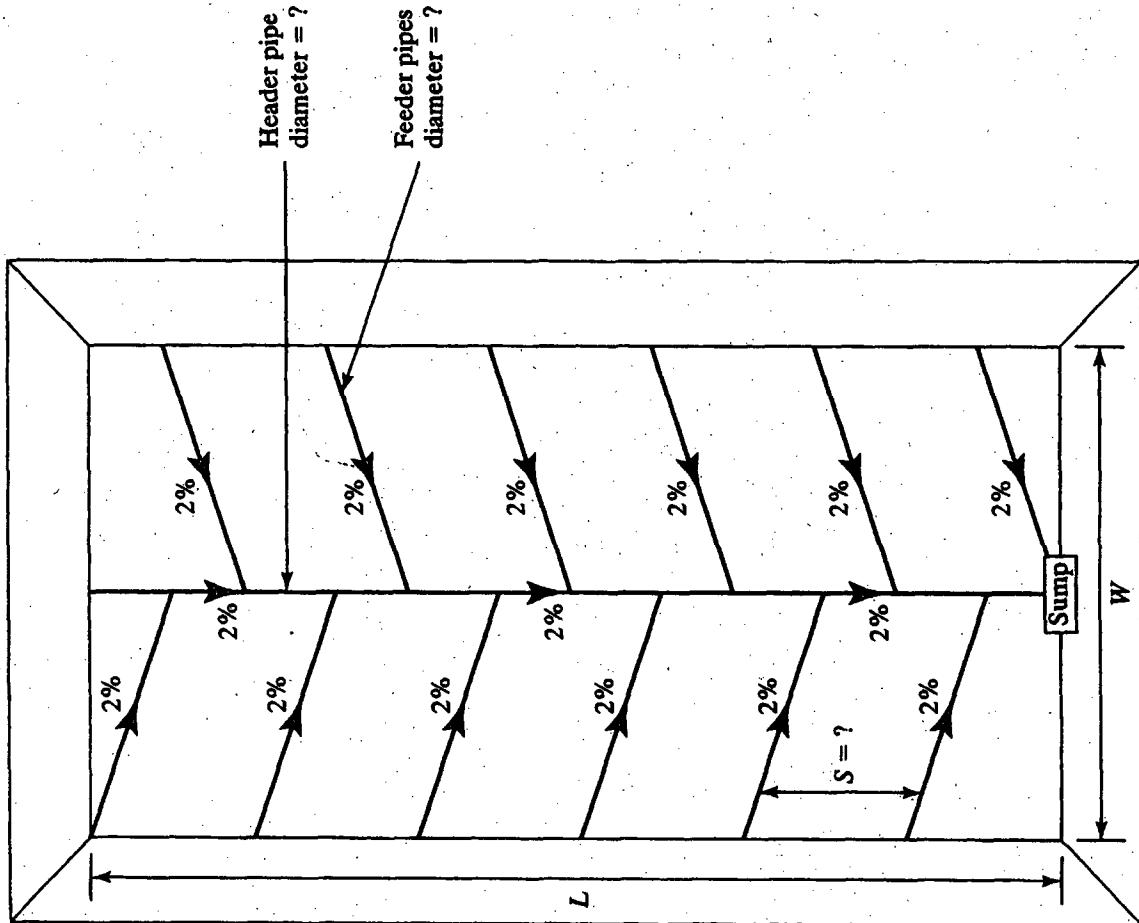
Typical plan view of the perforated pipe network of the leachate collection system for a landfill.
